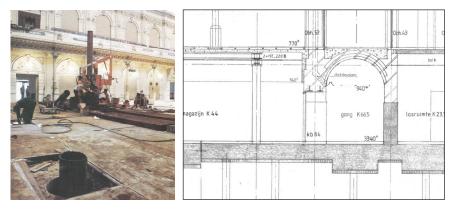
Left: Pile drilling in the main hall (2), right: section of the new situation
